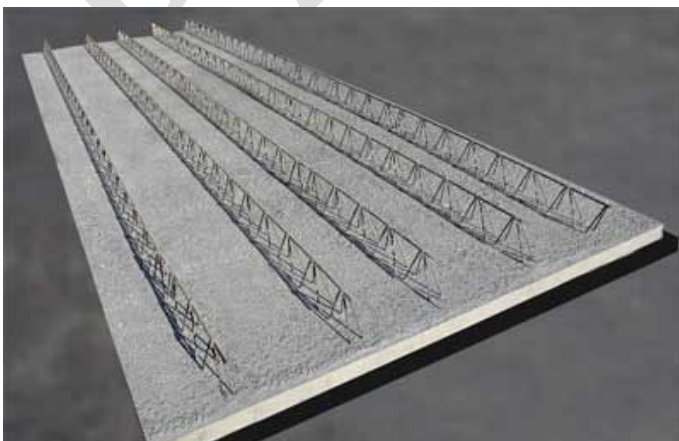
Precast Concrete Lattice Girder Plank(© Oran Pre-cast Ltd.)
